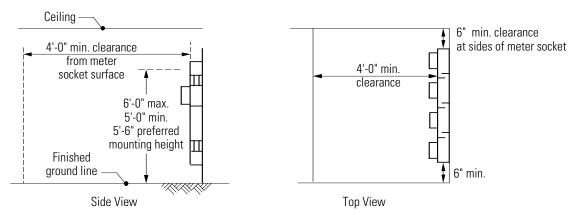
Grouped meters installed outdoors, and accessible to pedestrian traffic.
